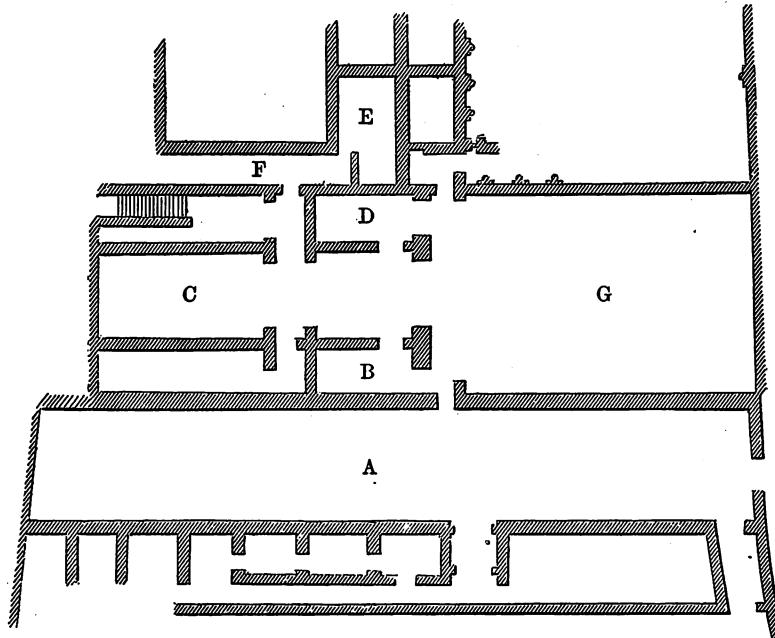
GROUND PLAN.—Scale 1 : 400.
